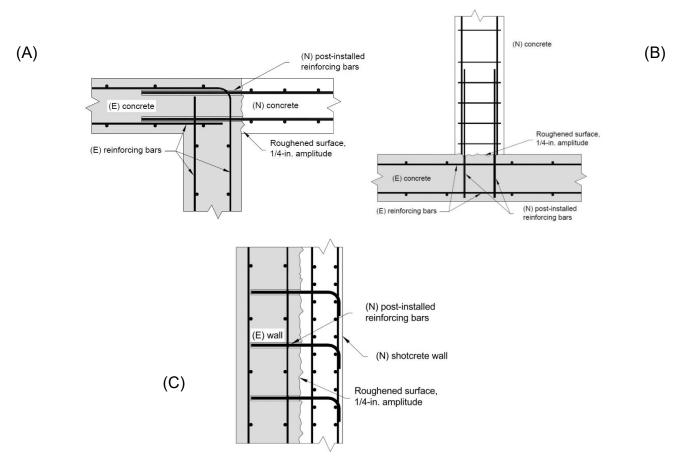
APPLICATION EXAMPLES FOR POST-INSTALLED REINFORCING BARS:
